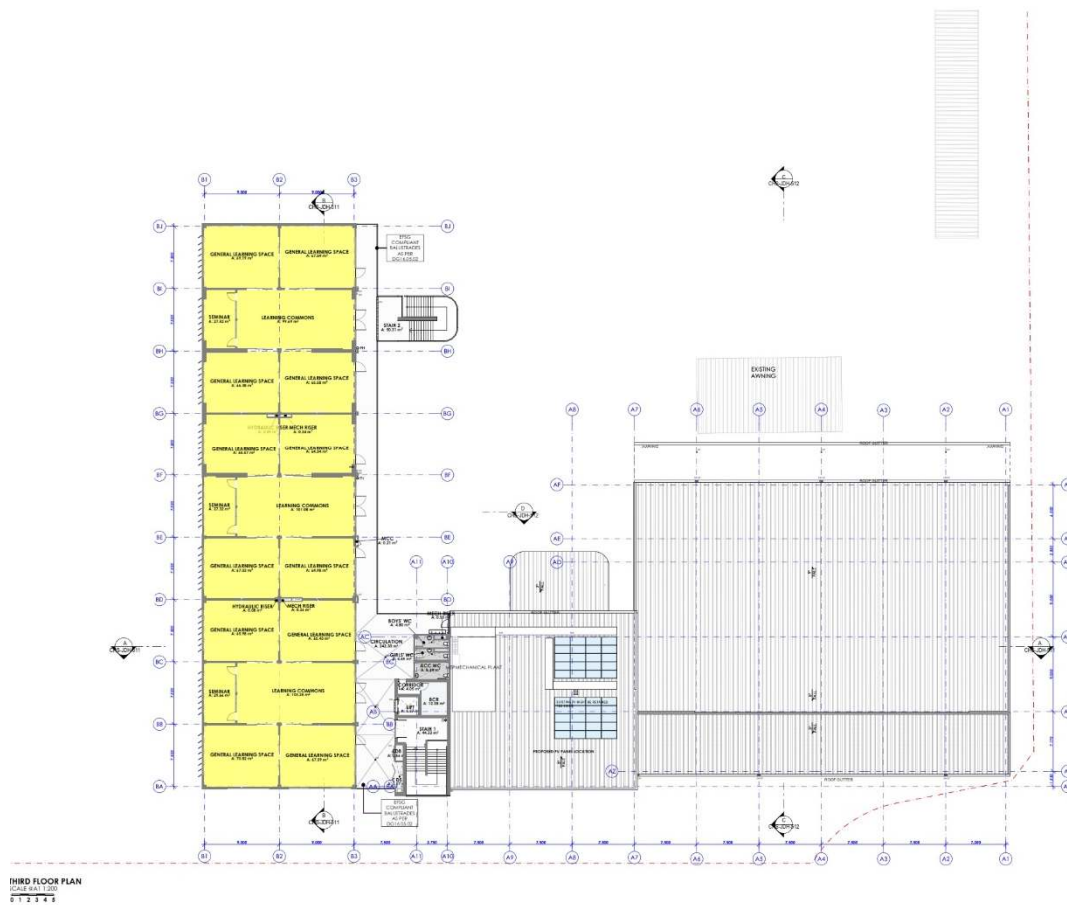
Third floor plan. *Source:* JDC Architects 2022.
